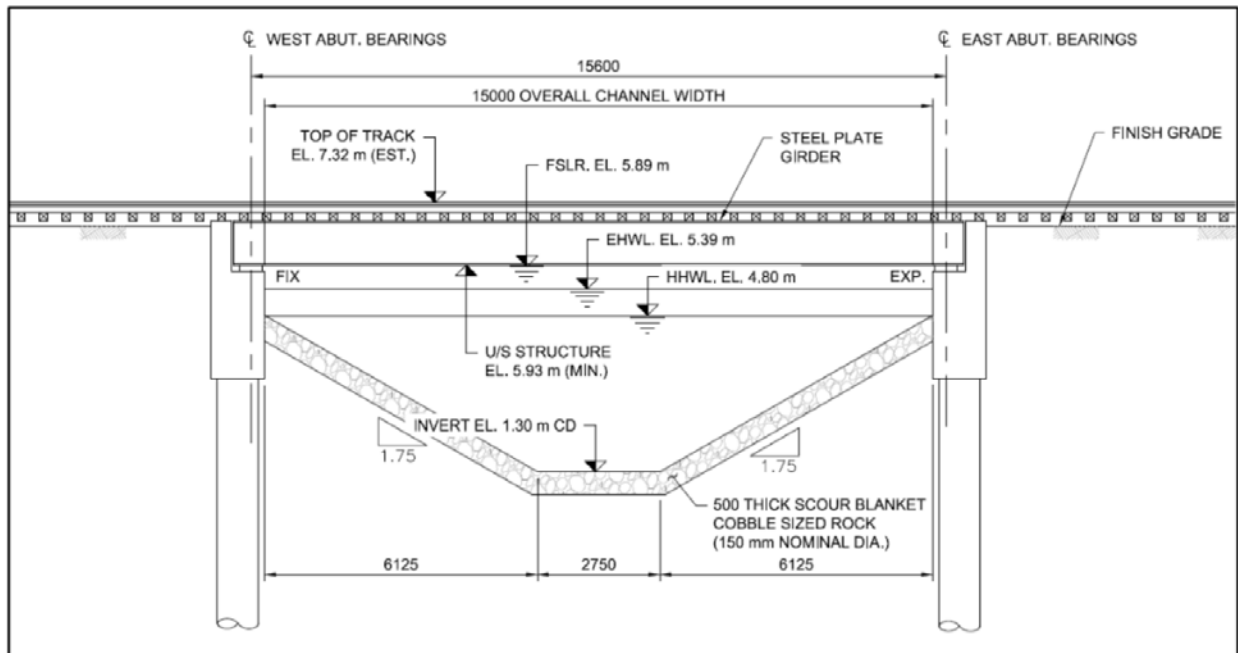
Marine Terminal Breach with bridge structure section at rail crossing (from Appendix IR2020-2.2-A).
